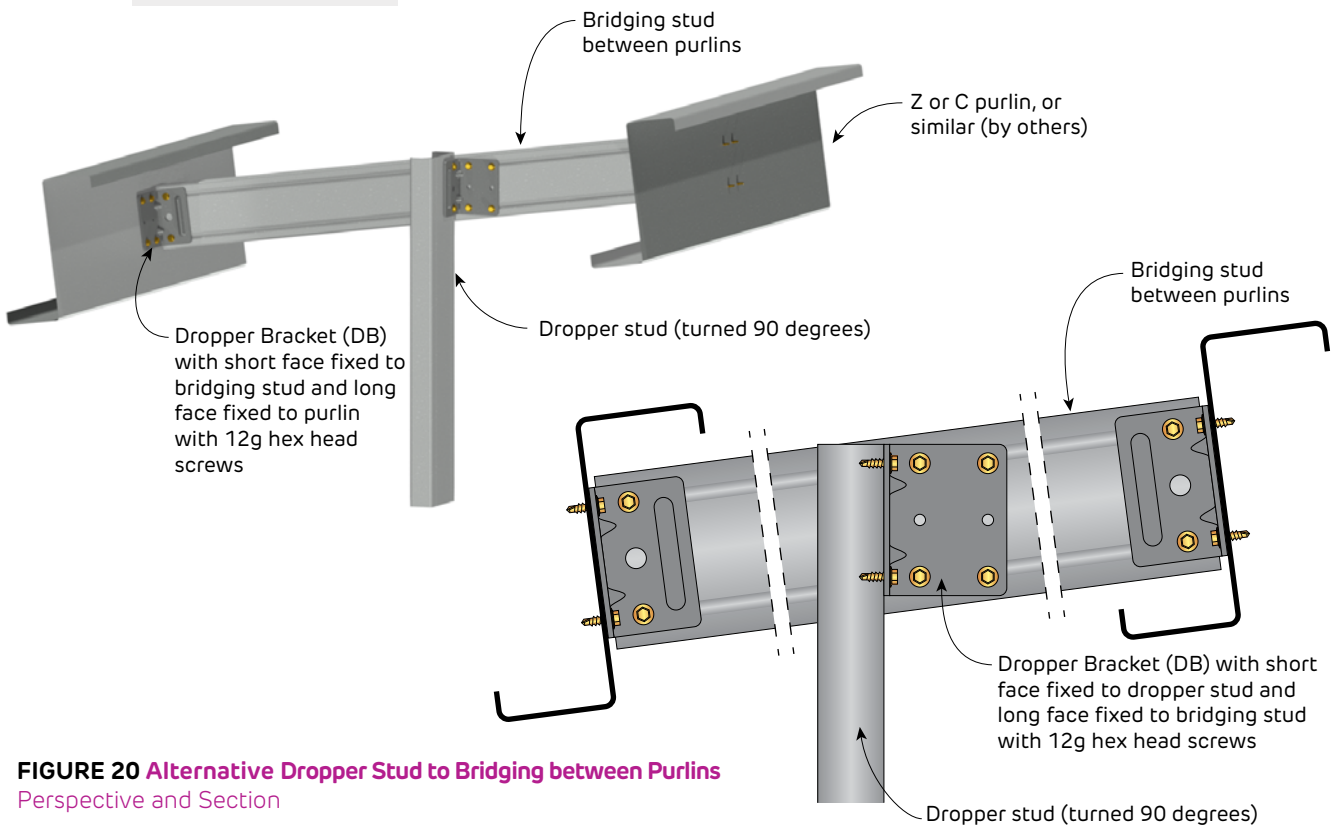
Alternative Dropper Stud to Bridging between Purlins
